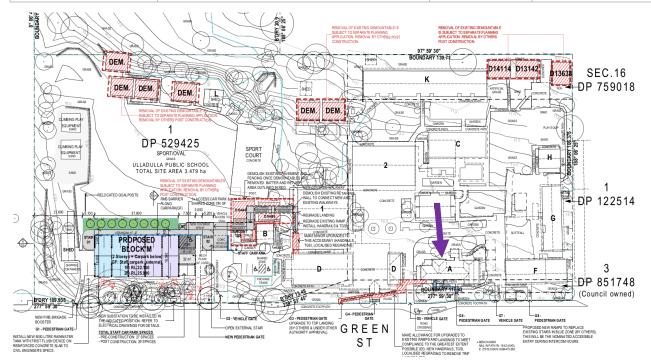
Proposed Site Plan for Ulladulla Public School, indicating location of proposed building. Heritage item is Building A (indicated by purple arrow). Prepared by Fulton Trotter Architects, 2025.
